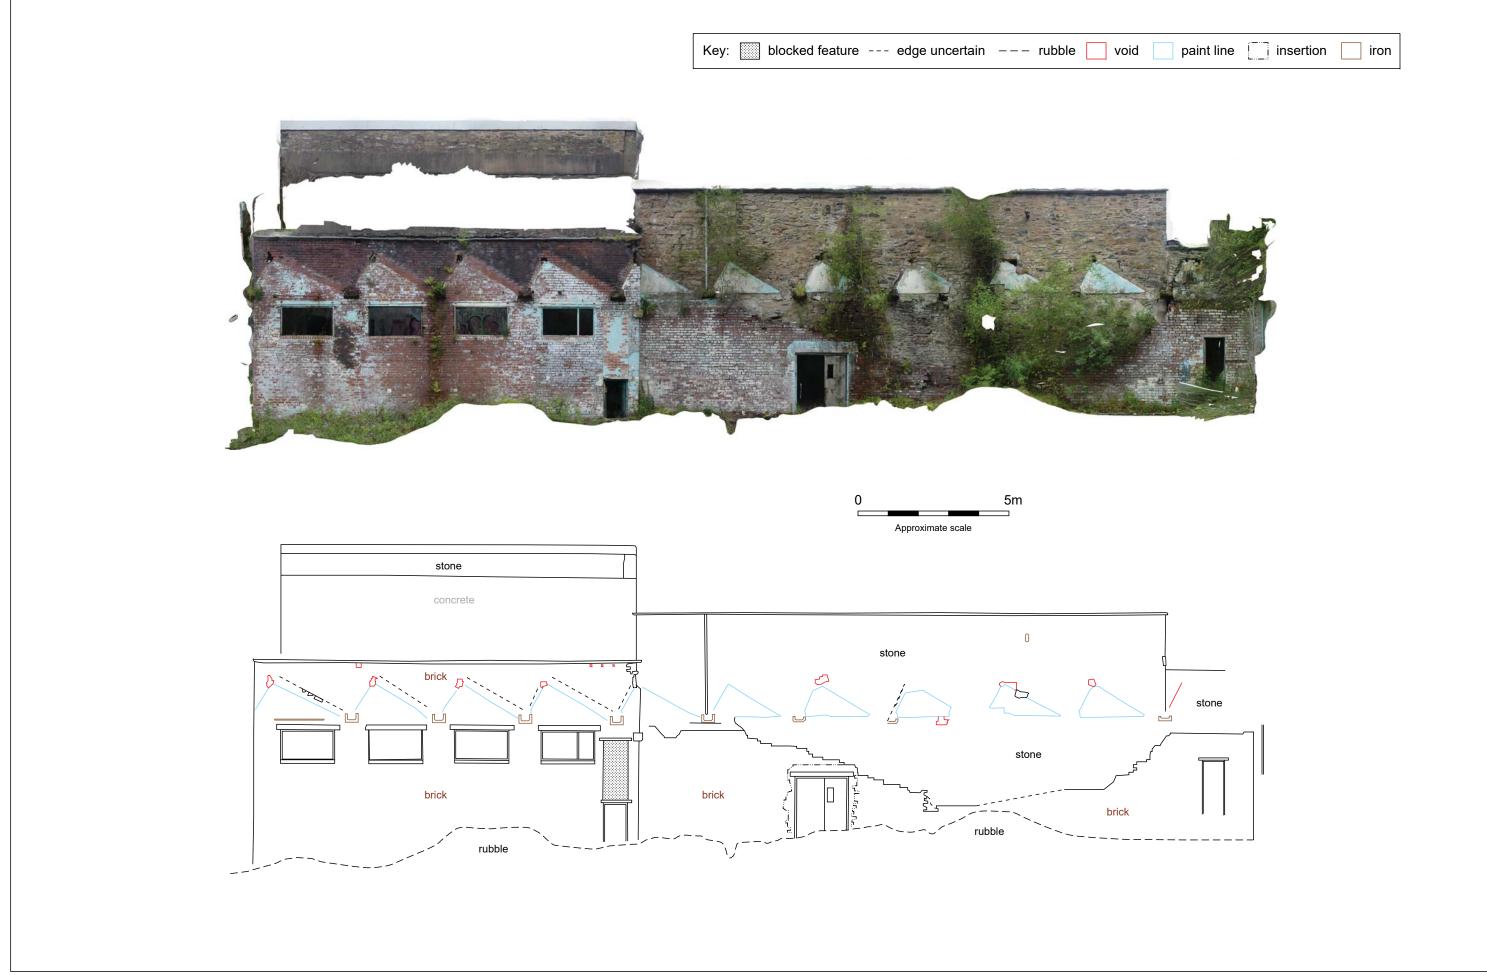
Rectified photograph and annotated drawing of the north-west external elevation of the mill building (Area D)
